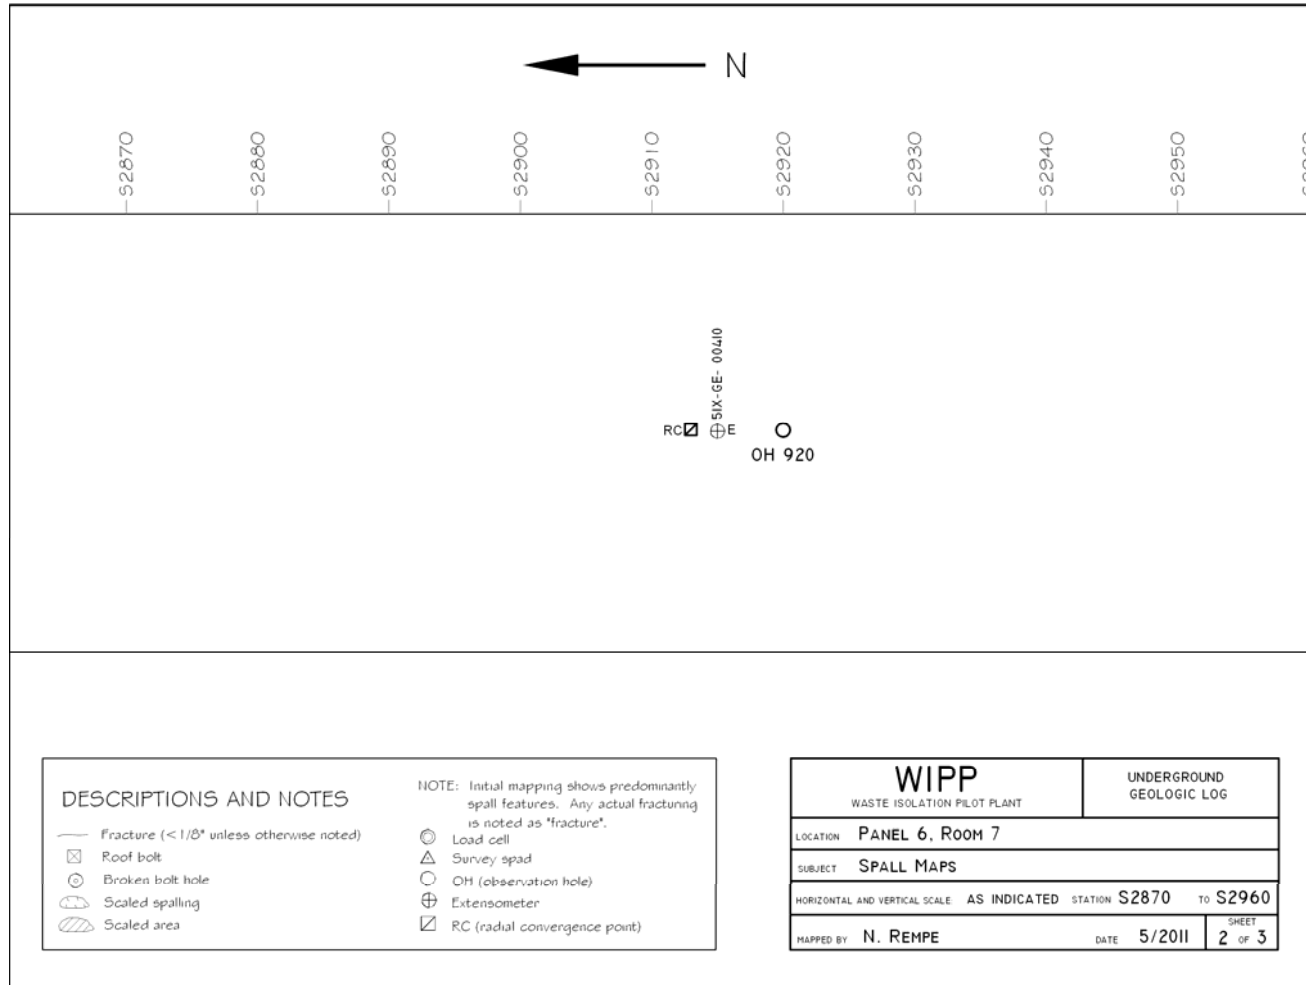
Panel 6 Room 7, S2770-S3060 Roof Fractures (Sheet 2 of 3)
